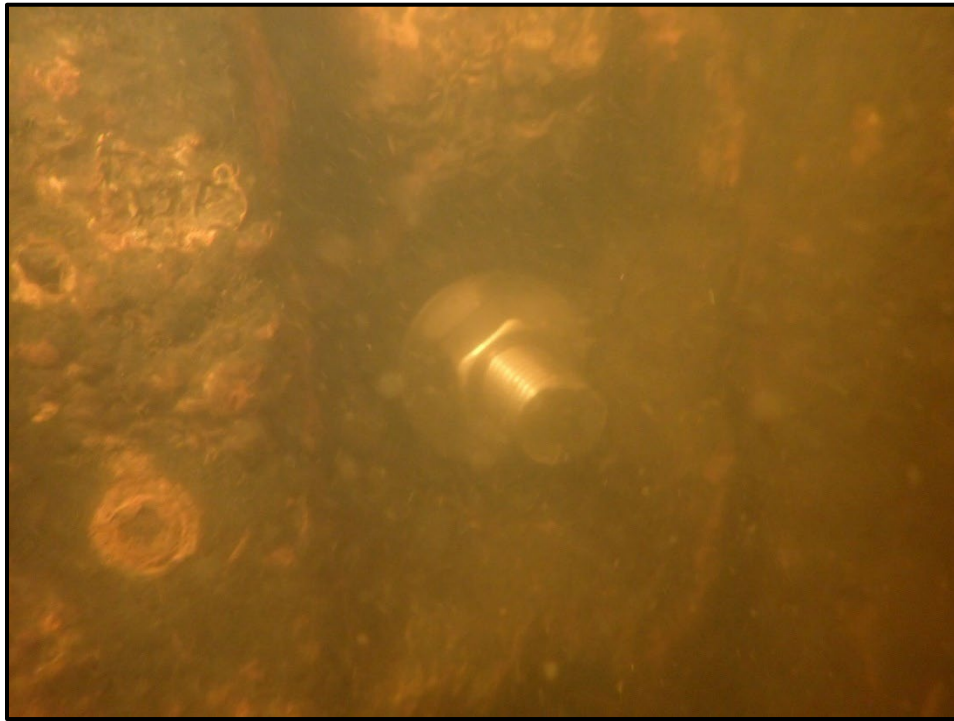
Typical Epoxy Anchor as Installed Through Vertical Guide
